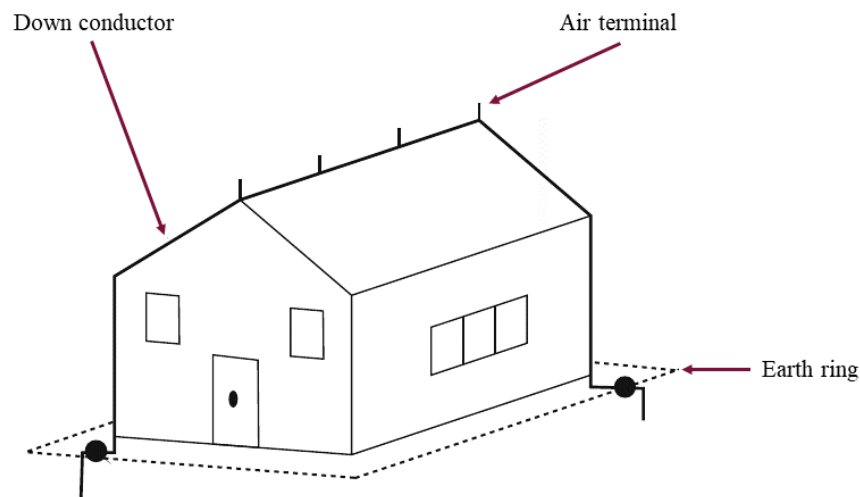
External LPS of a house with air terminals on the roof. Figure adapted from [8].
